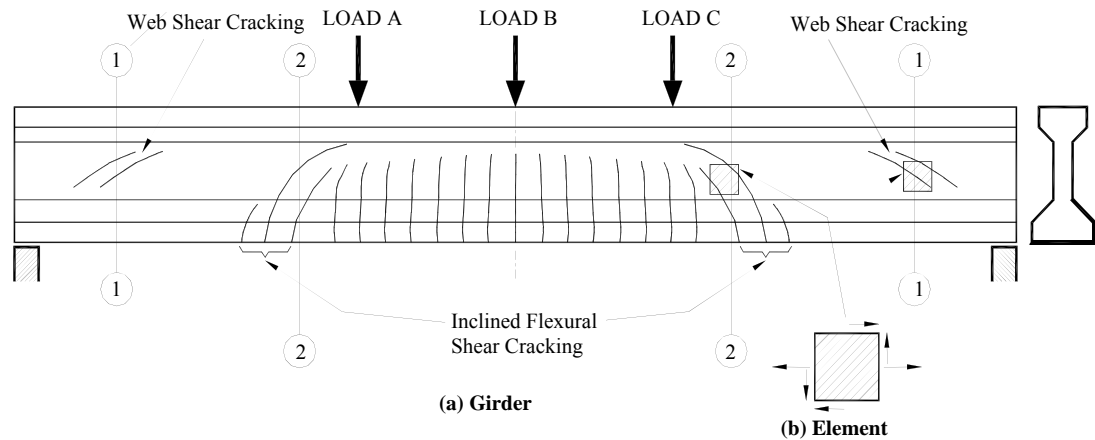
Typical Shear Failure Modes in I-Girders
